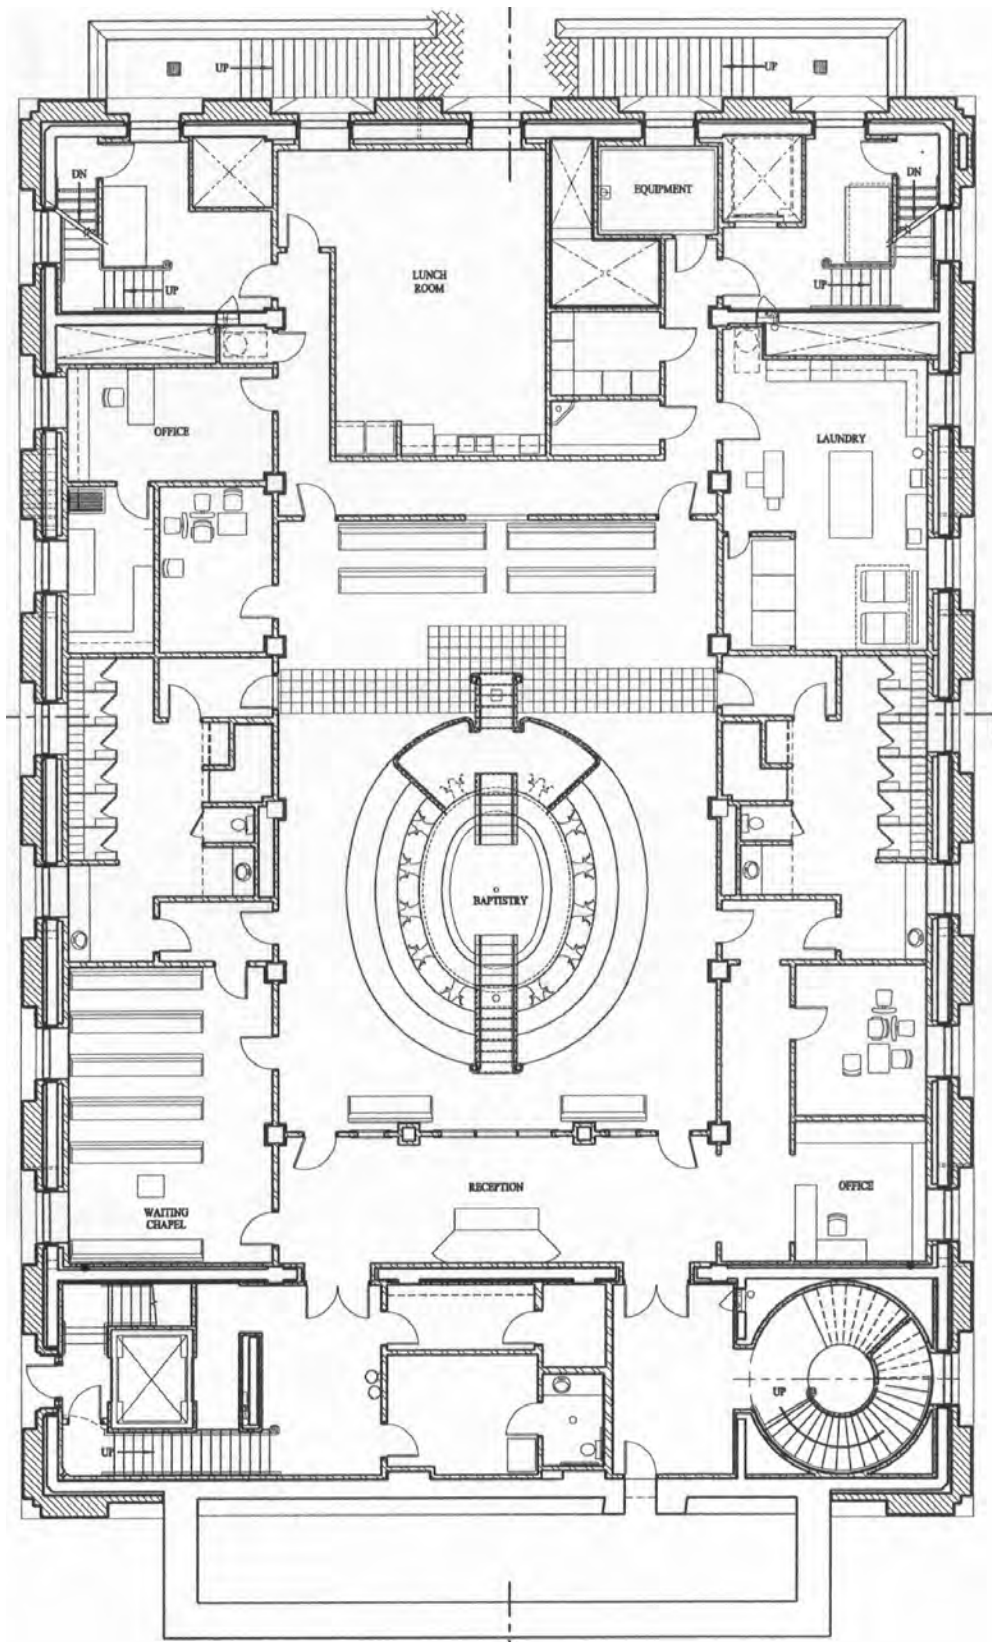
Basement floor plan of the new Nauvoo temple. Compare with original plans of the main floor on Figure 4. Courtesy FFKR Architects.
